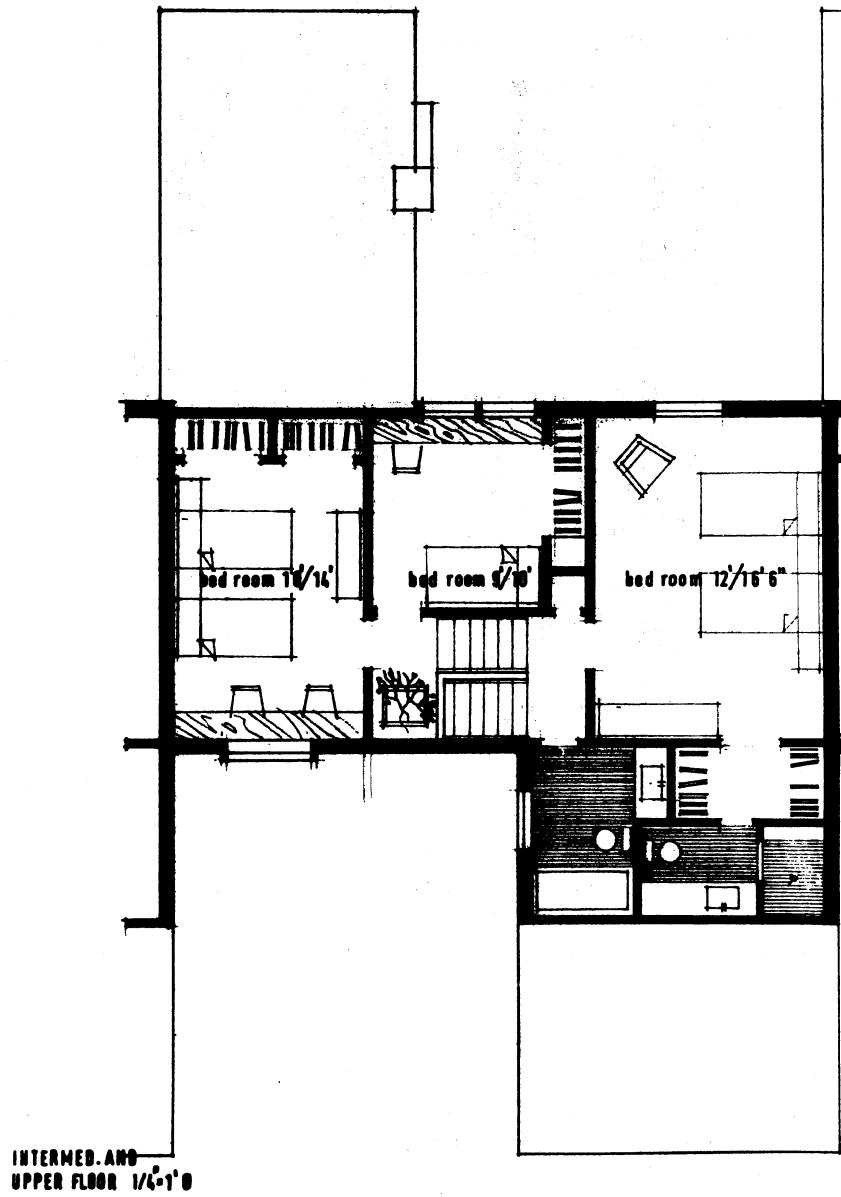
"Court-Yard" House Intermediate and Upper Floor Plan
